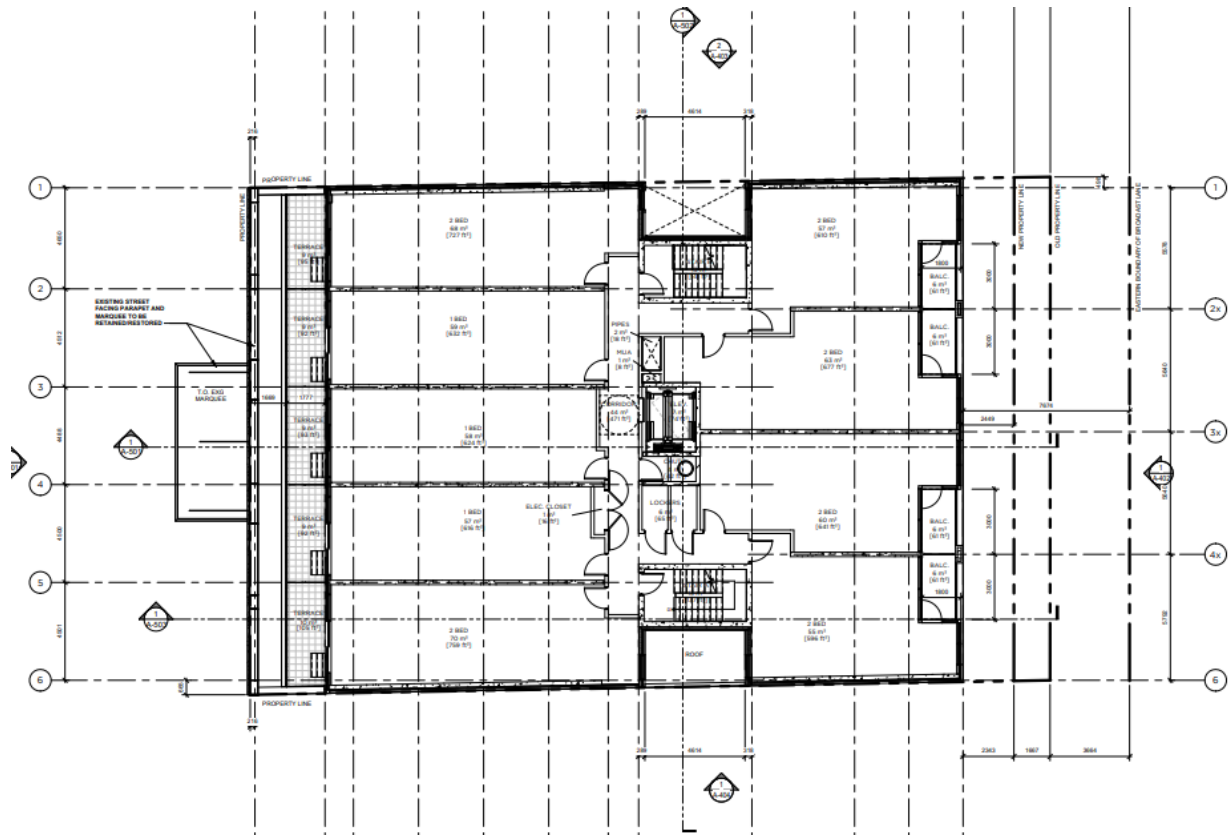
Proposed second floor for 509 Parliament Street (RAW Architects Inc., 2025).
